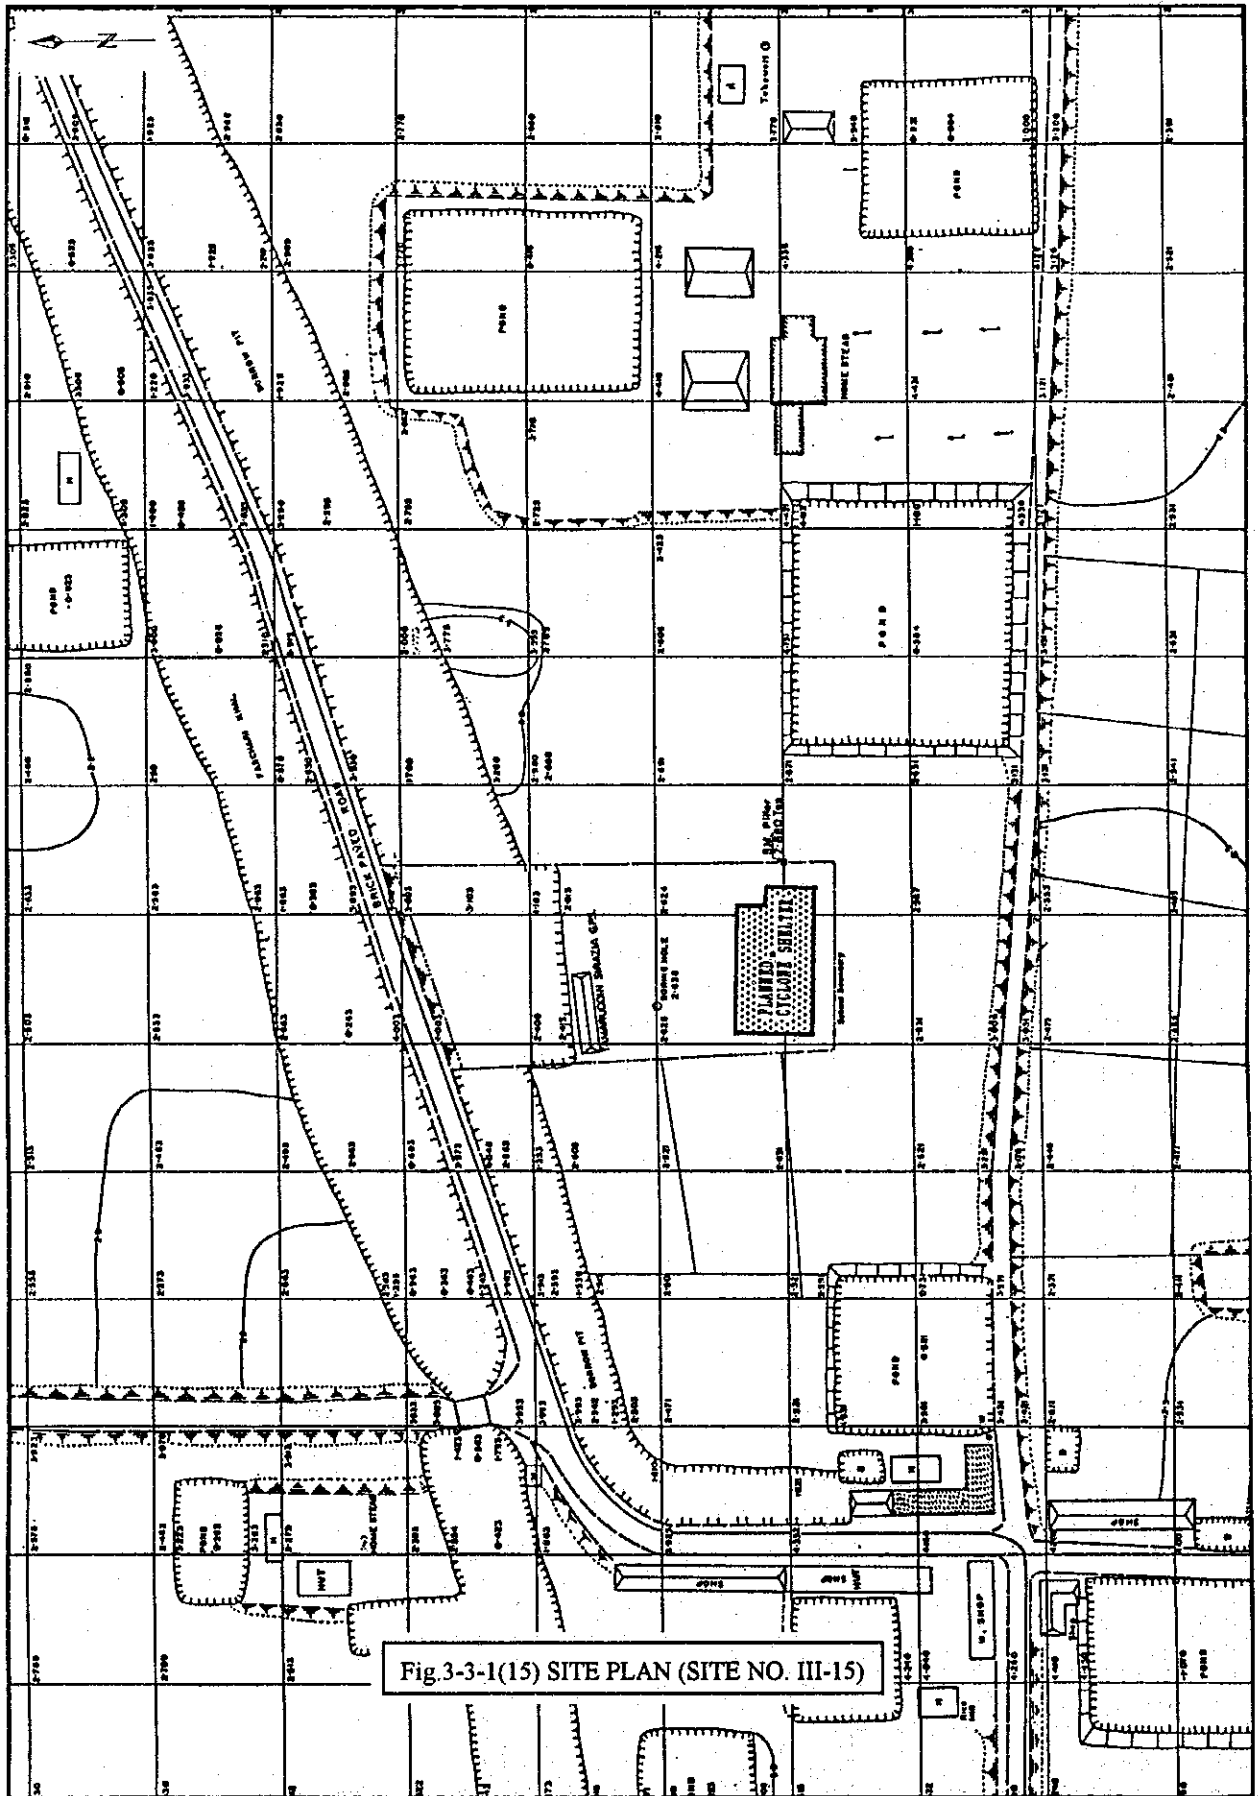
(15) SITE PLAN (SITE NO. III-15)
